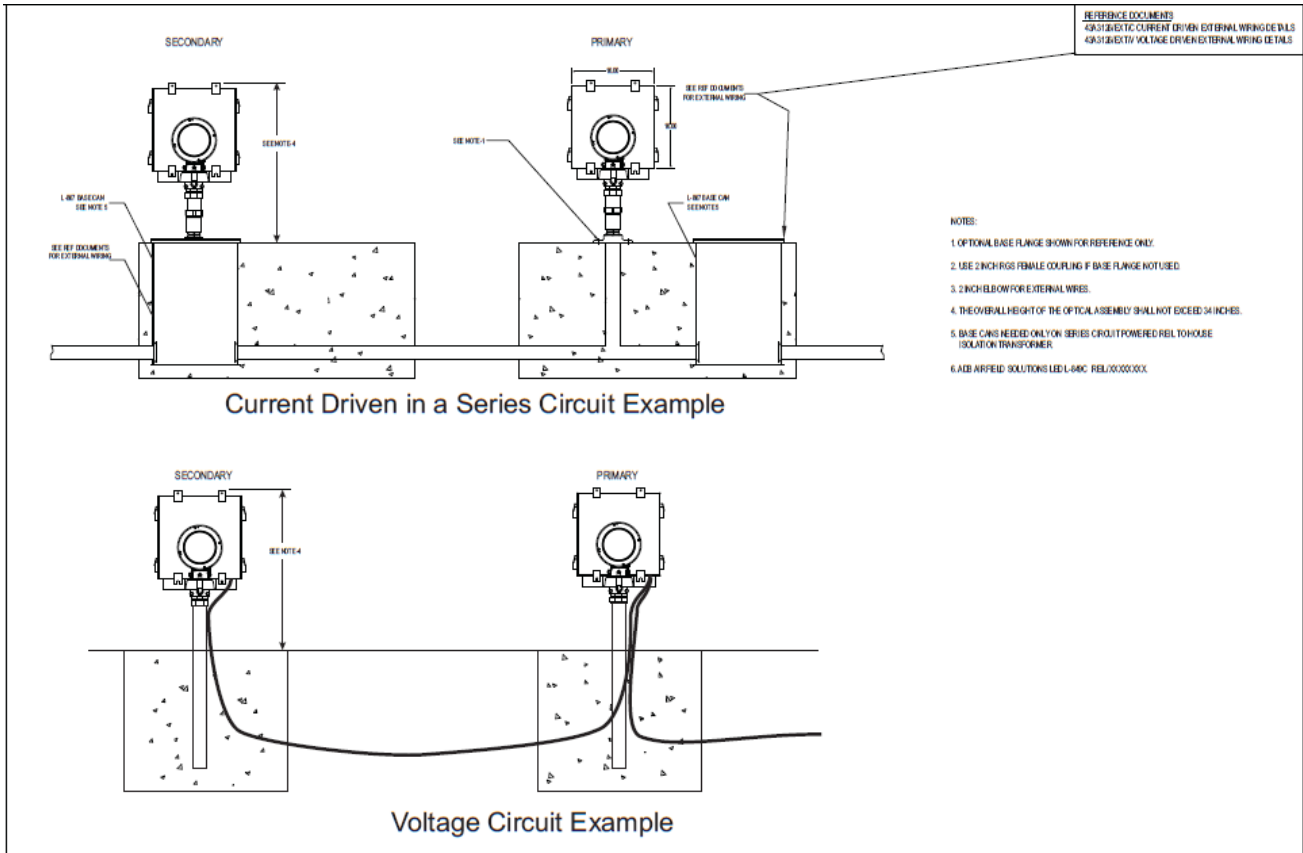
L-849 C Runway End Identifier Lights Typical Installation Details
